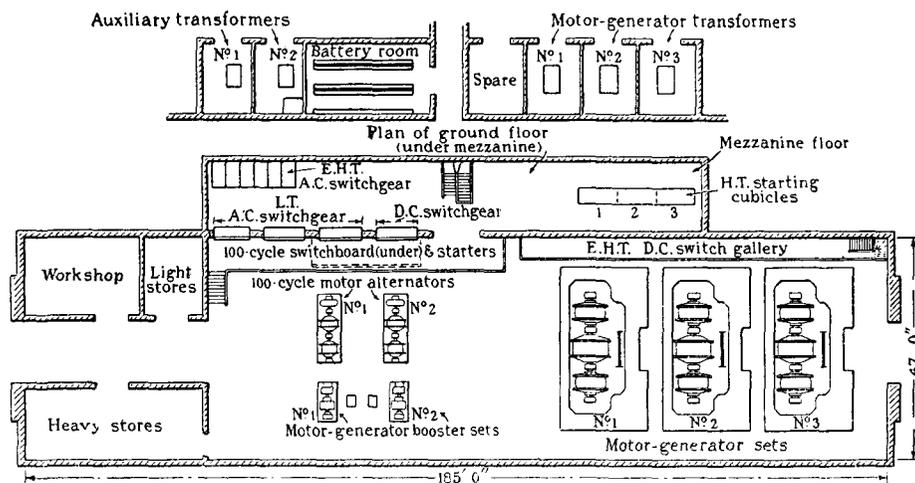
PLAN OF POWER HOUSE (scale $\frac{1}{4}$ in. = 1 foot).
